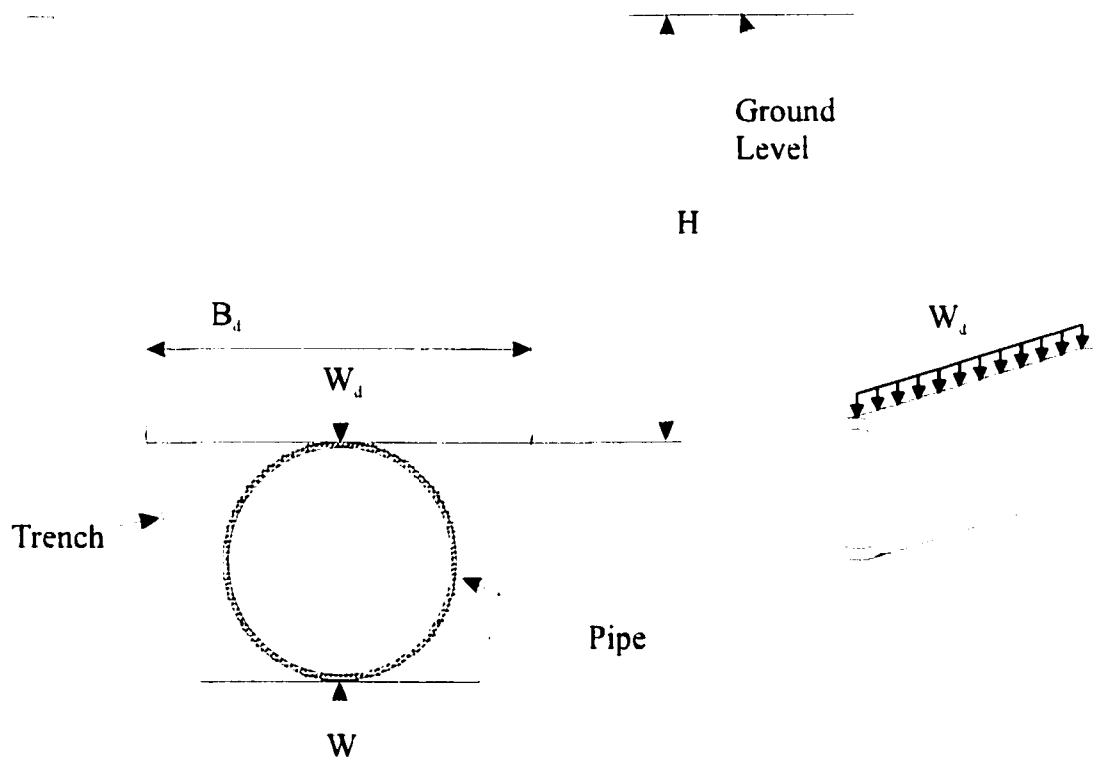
Schematic of soil overburden for a buried pipeline installation
